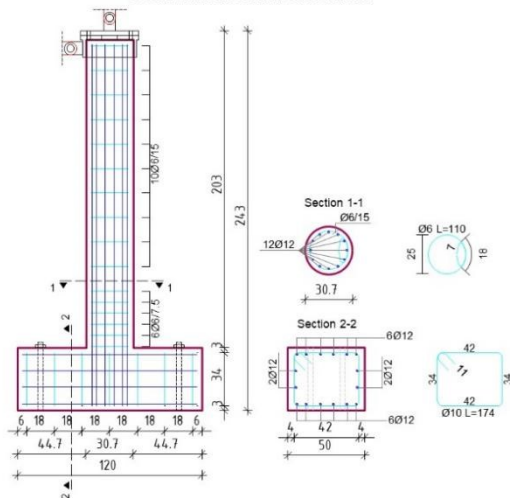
Geometry and reinforcement of the tested flexural failure circular RC bridge pier prototype models M1-A and M1-B.
